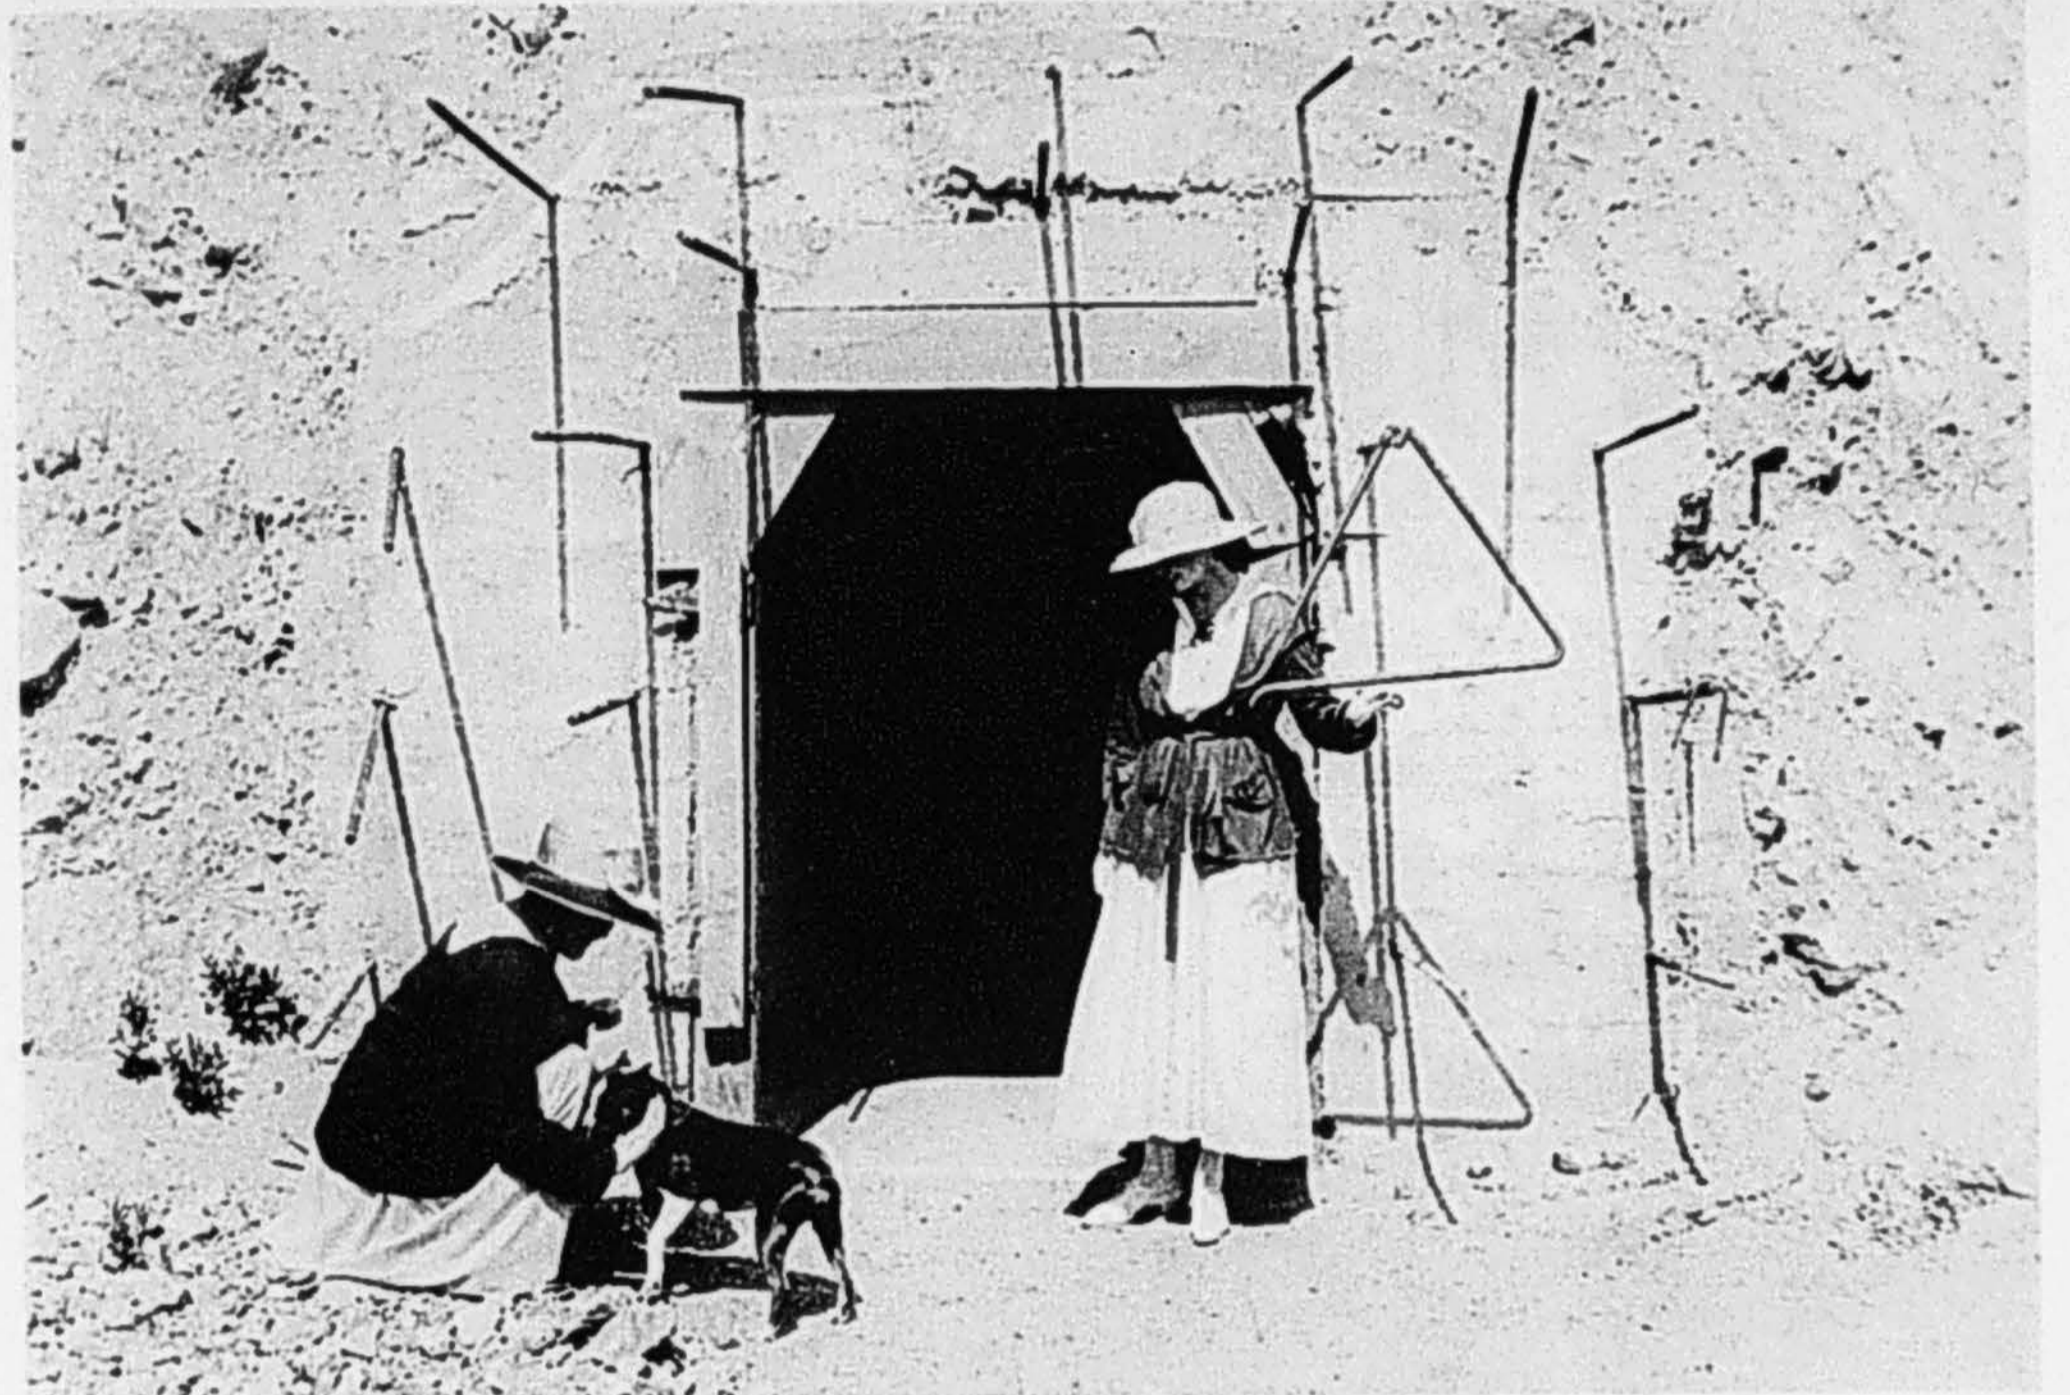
Upper Portal of Outlet Tunnel, Warner Dam Site.
